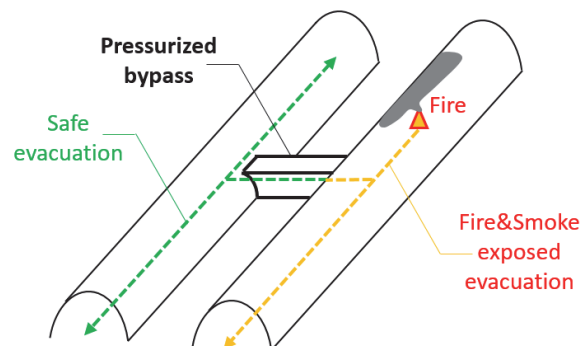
Sketch of the evacuation from a road tunnel equipped with pressurised bypass
